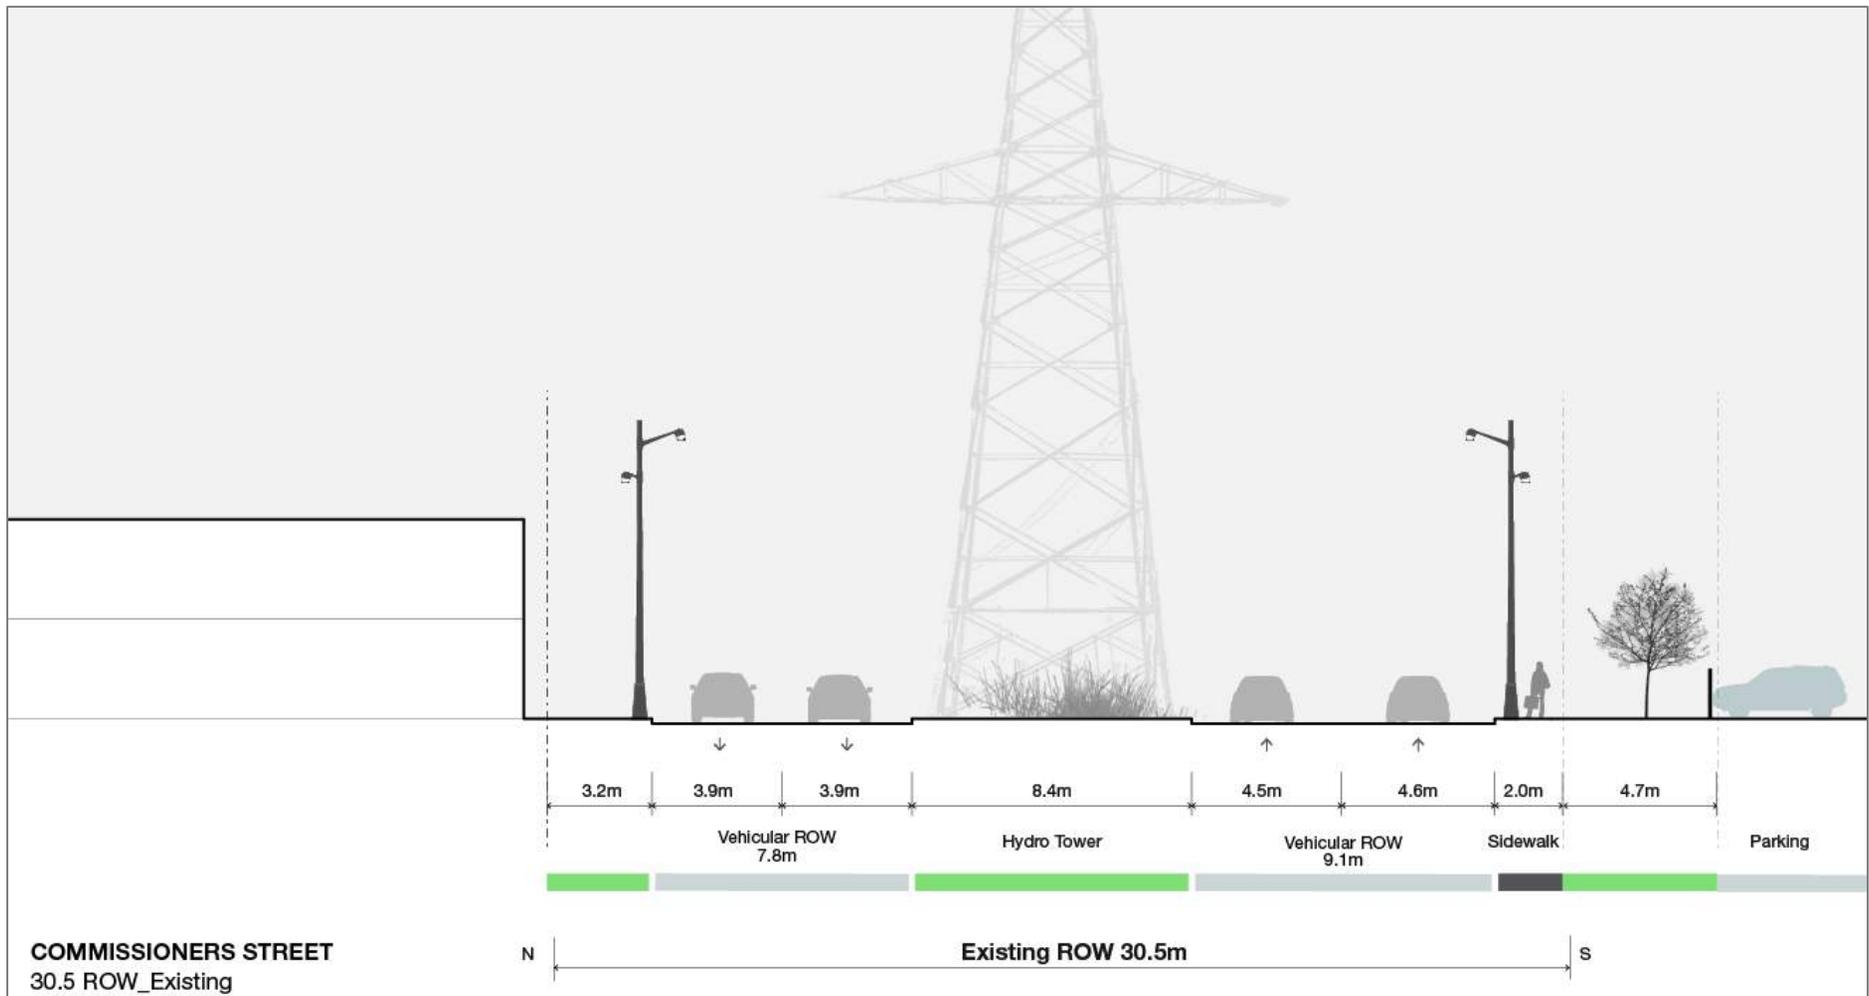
CROSS-SECTION – EXISTING COMMISSIONERS STREET, BOUCHETTE STREET TO CARLAW AVENUE
